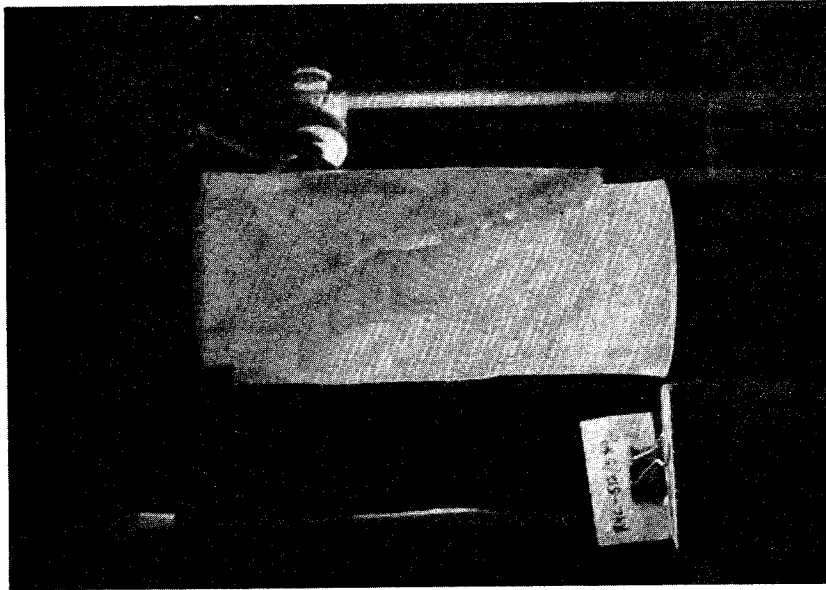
Photographic example of the fundamental shear failure mode.
